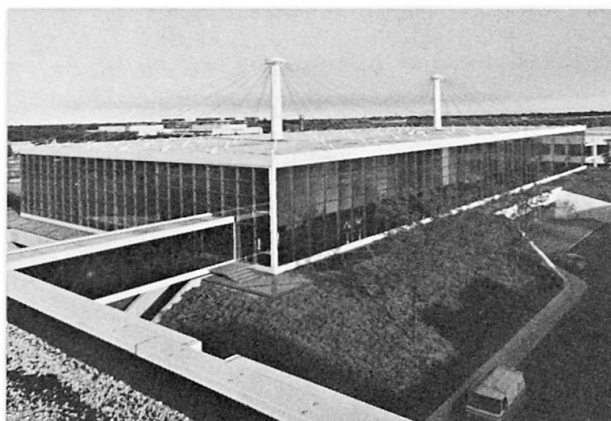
The suspended roof system for Baxter Laboratories Dining Hall
